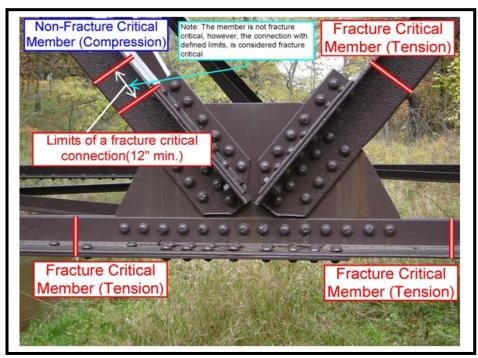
4-1: Fracture Critical Truss Connection
